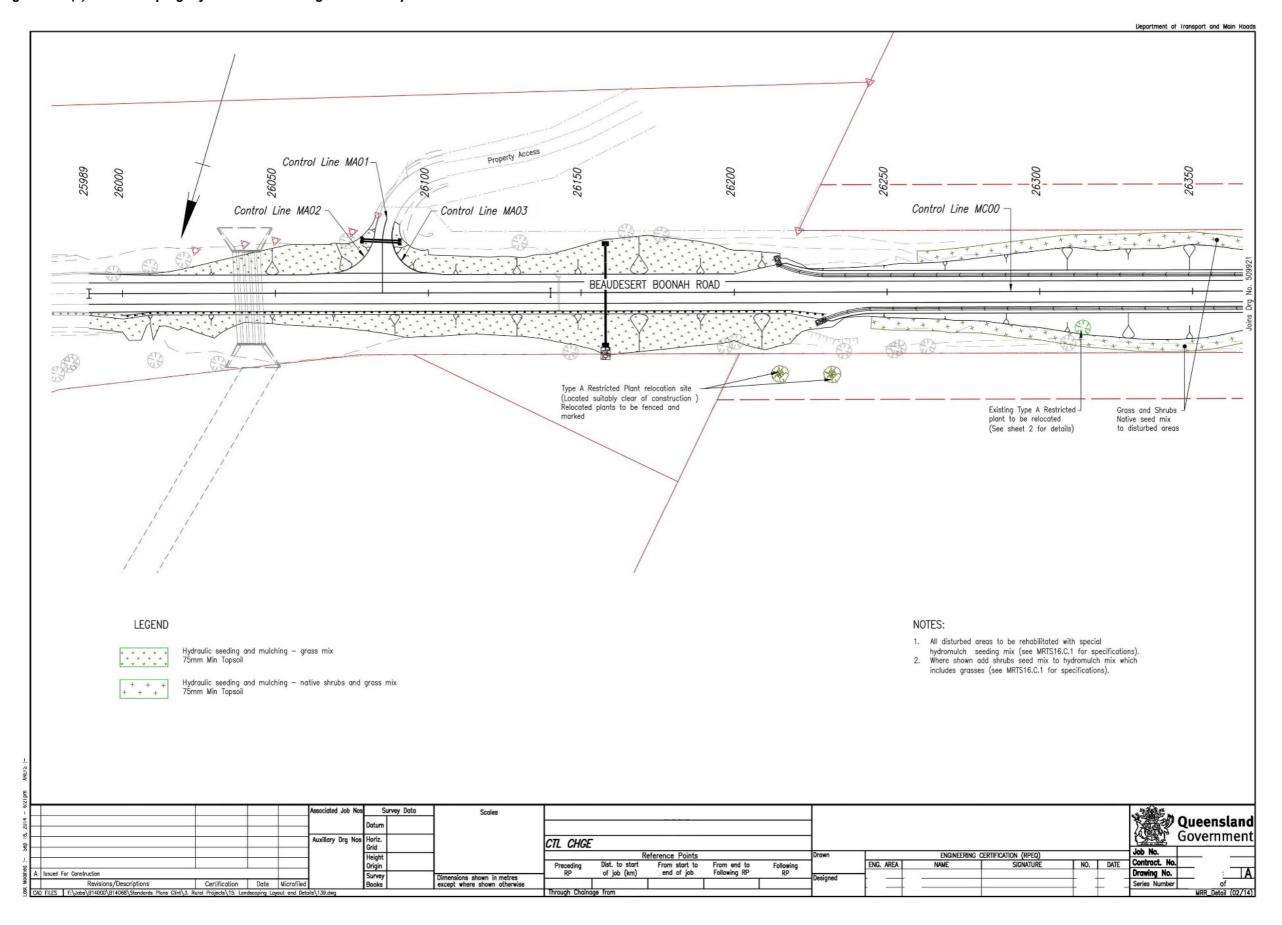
(b) - Landscaping details and layouts - generic example 2 - sheet 1 of 4
